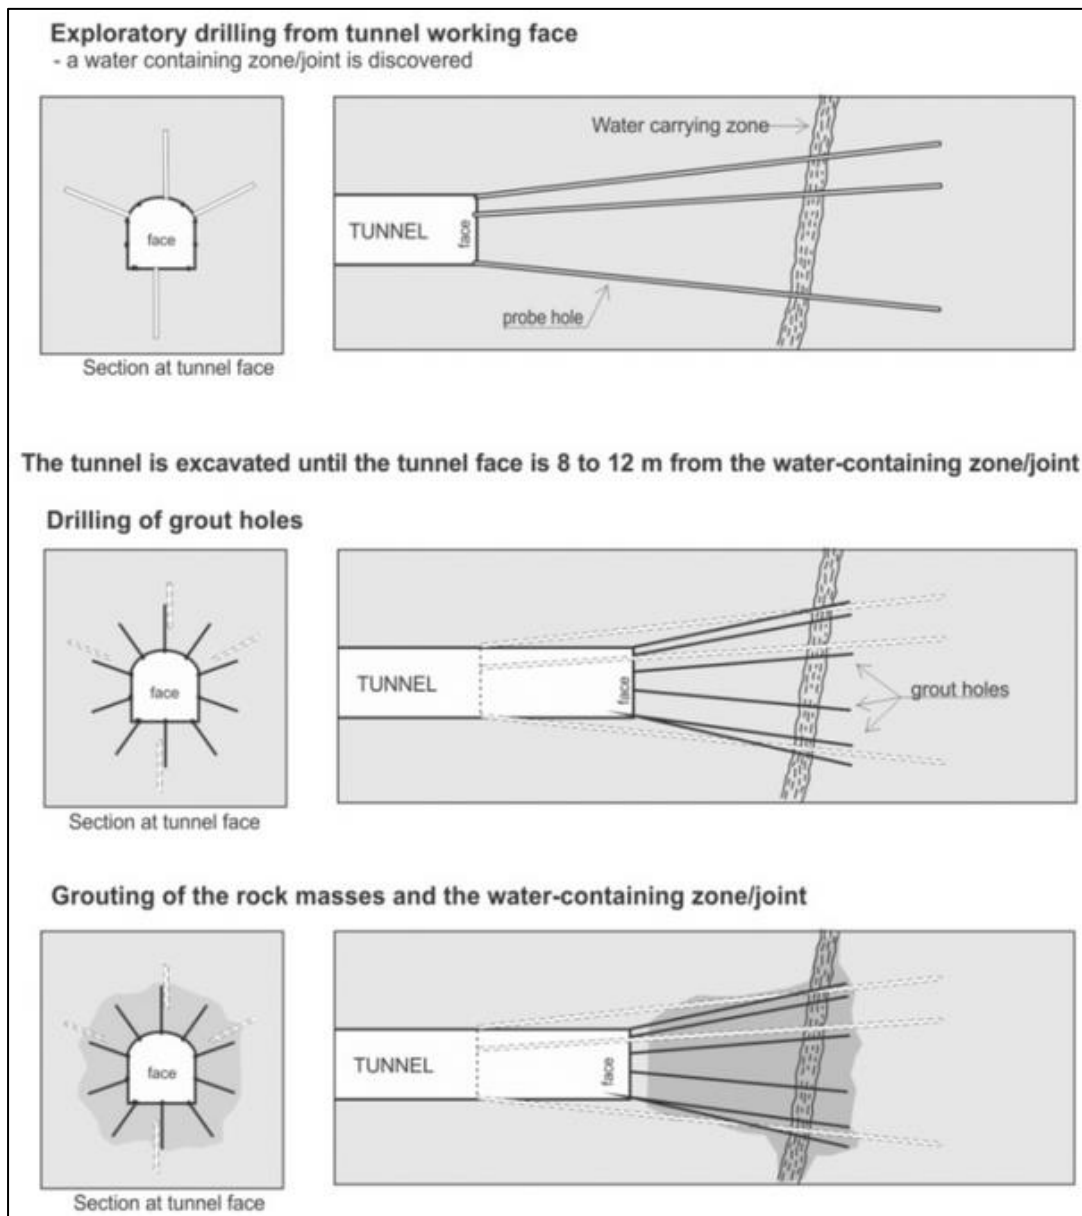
| PRINCIPLES OF PROBE DRILLING AND PRE-GROUTING
